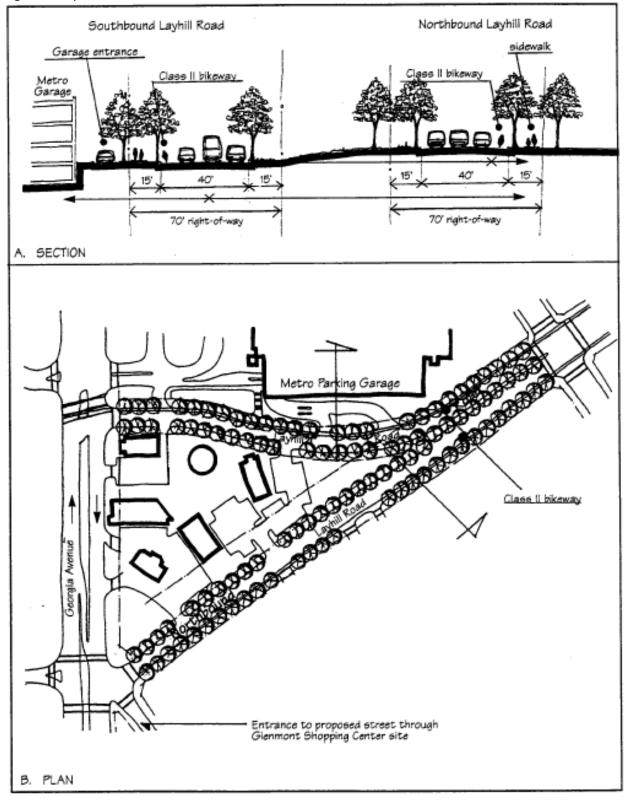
Layhill Bifurcation—1997 Glenmont Sector Plan
